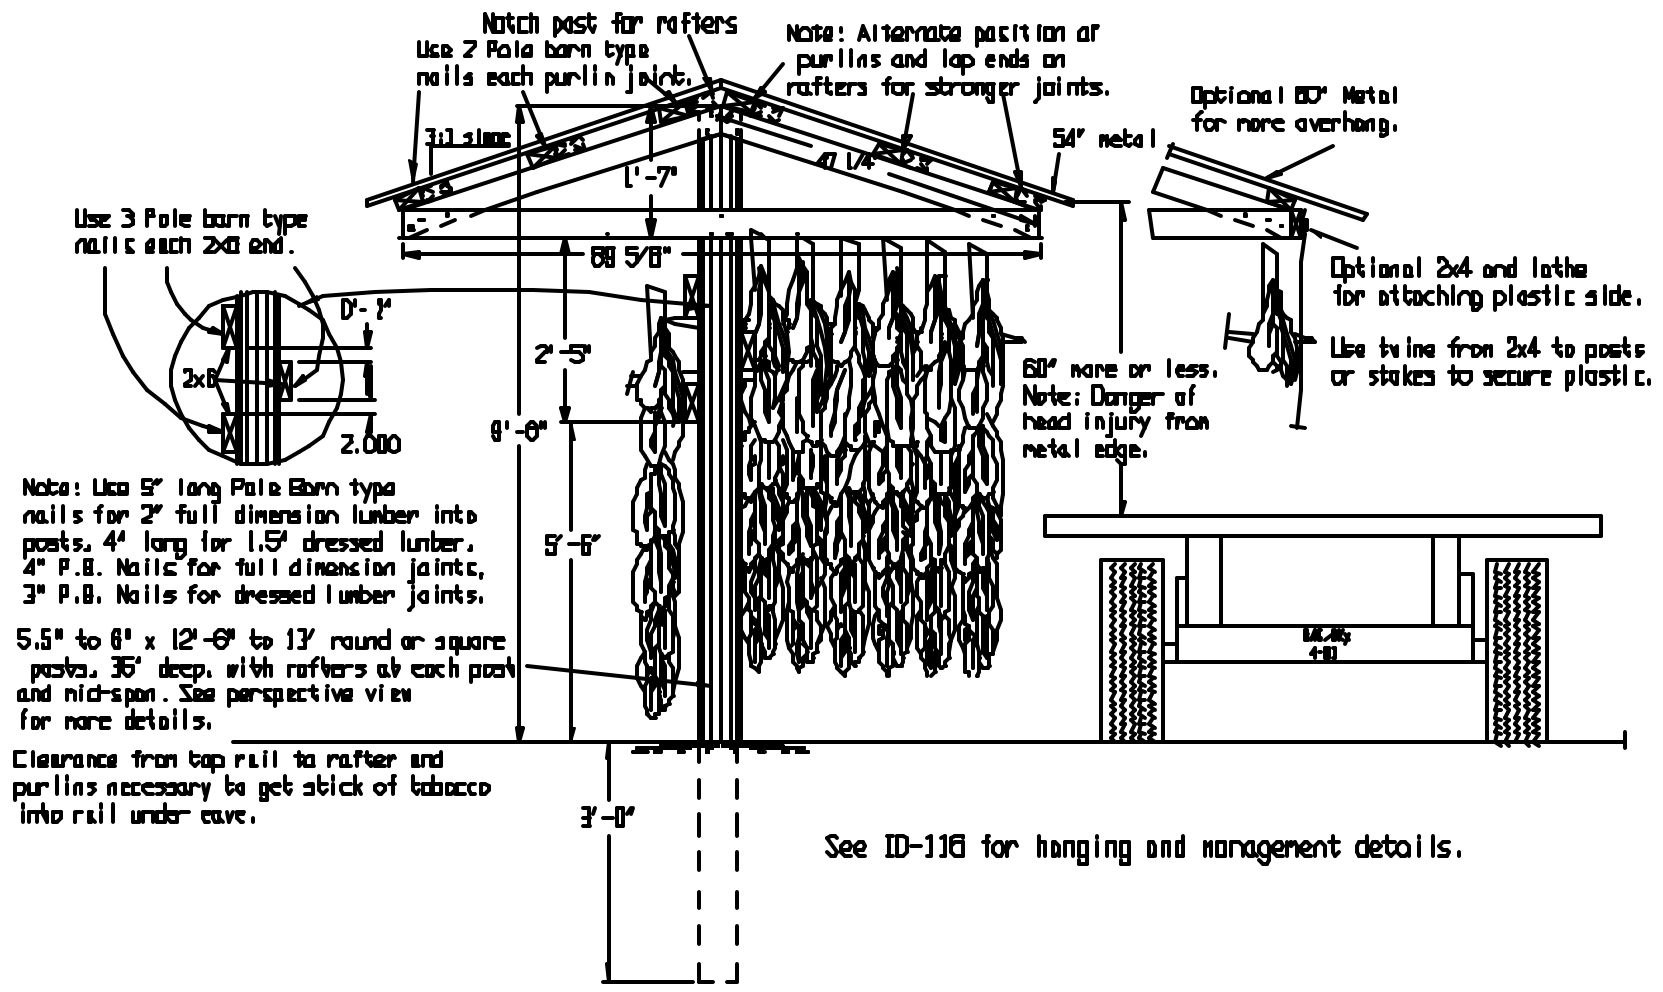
Post-Rail Metal-Roof Construction for hanging from ground level.
